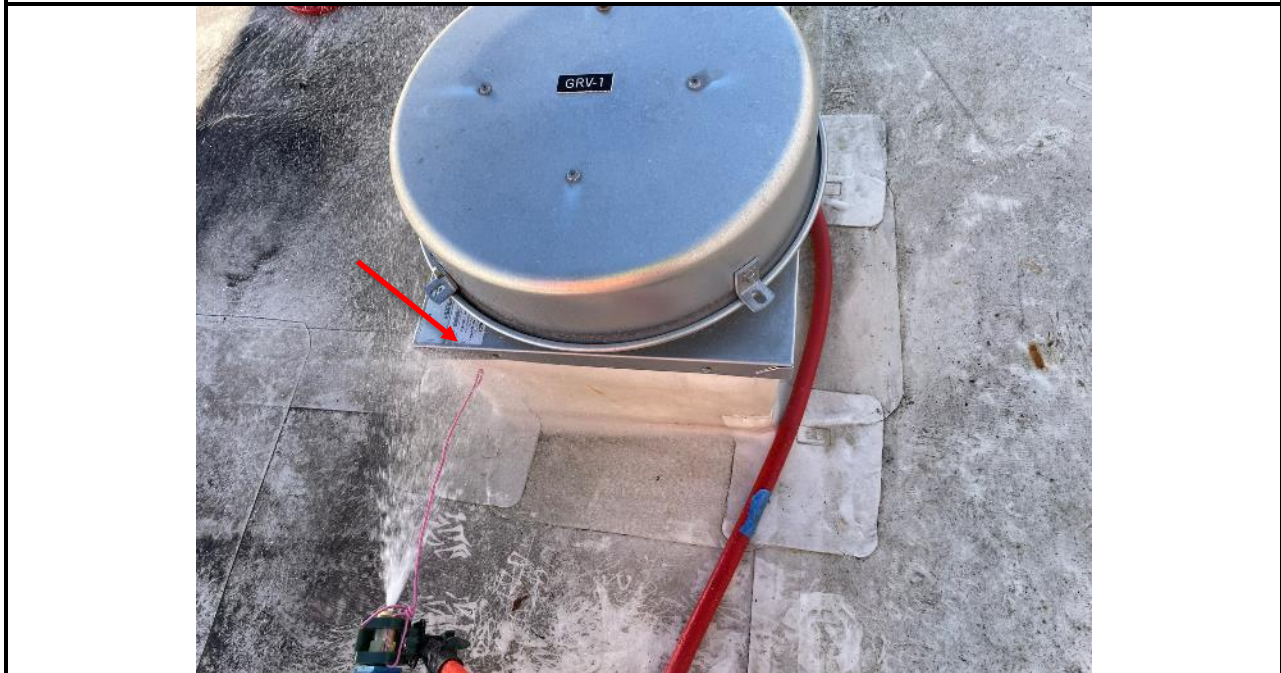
Test location #1 - water was applied along the metal cover at exhaust fan equipment curb (GRV-1) with unsealed fastener penetrations appears to be larger than necessary.
